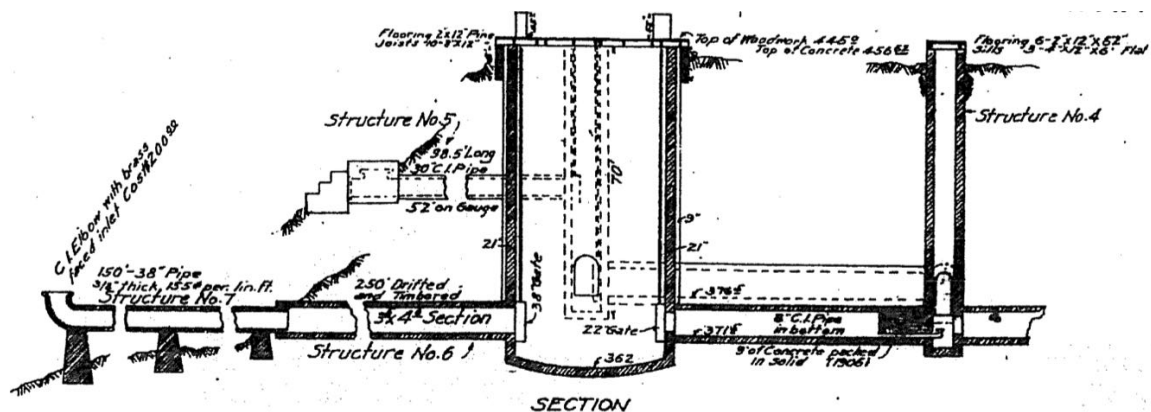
Cross Section of San Andreas Outlet Works, 1914 (SVWC Drawing)
